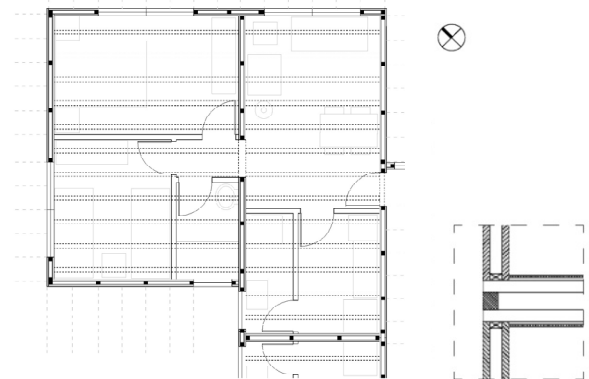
apartment plan with Sandwich Panel System (5) (section detail of wall-slab connection) – no scale drawing
